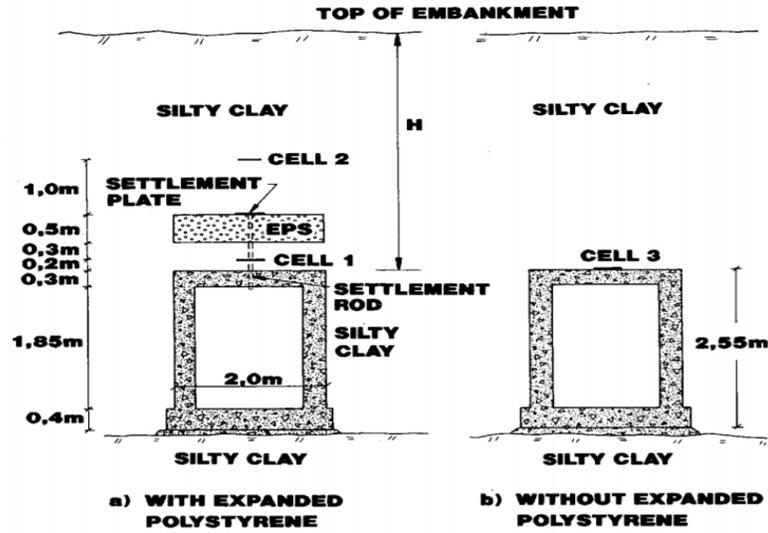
Buried Culvert Vertical Pressure Test Setup
